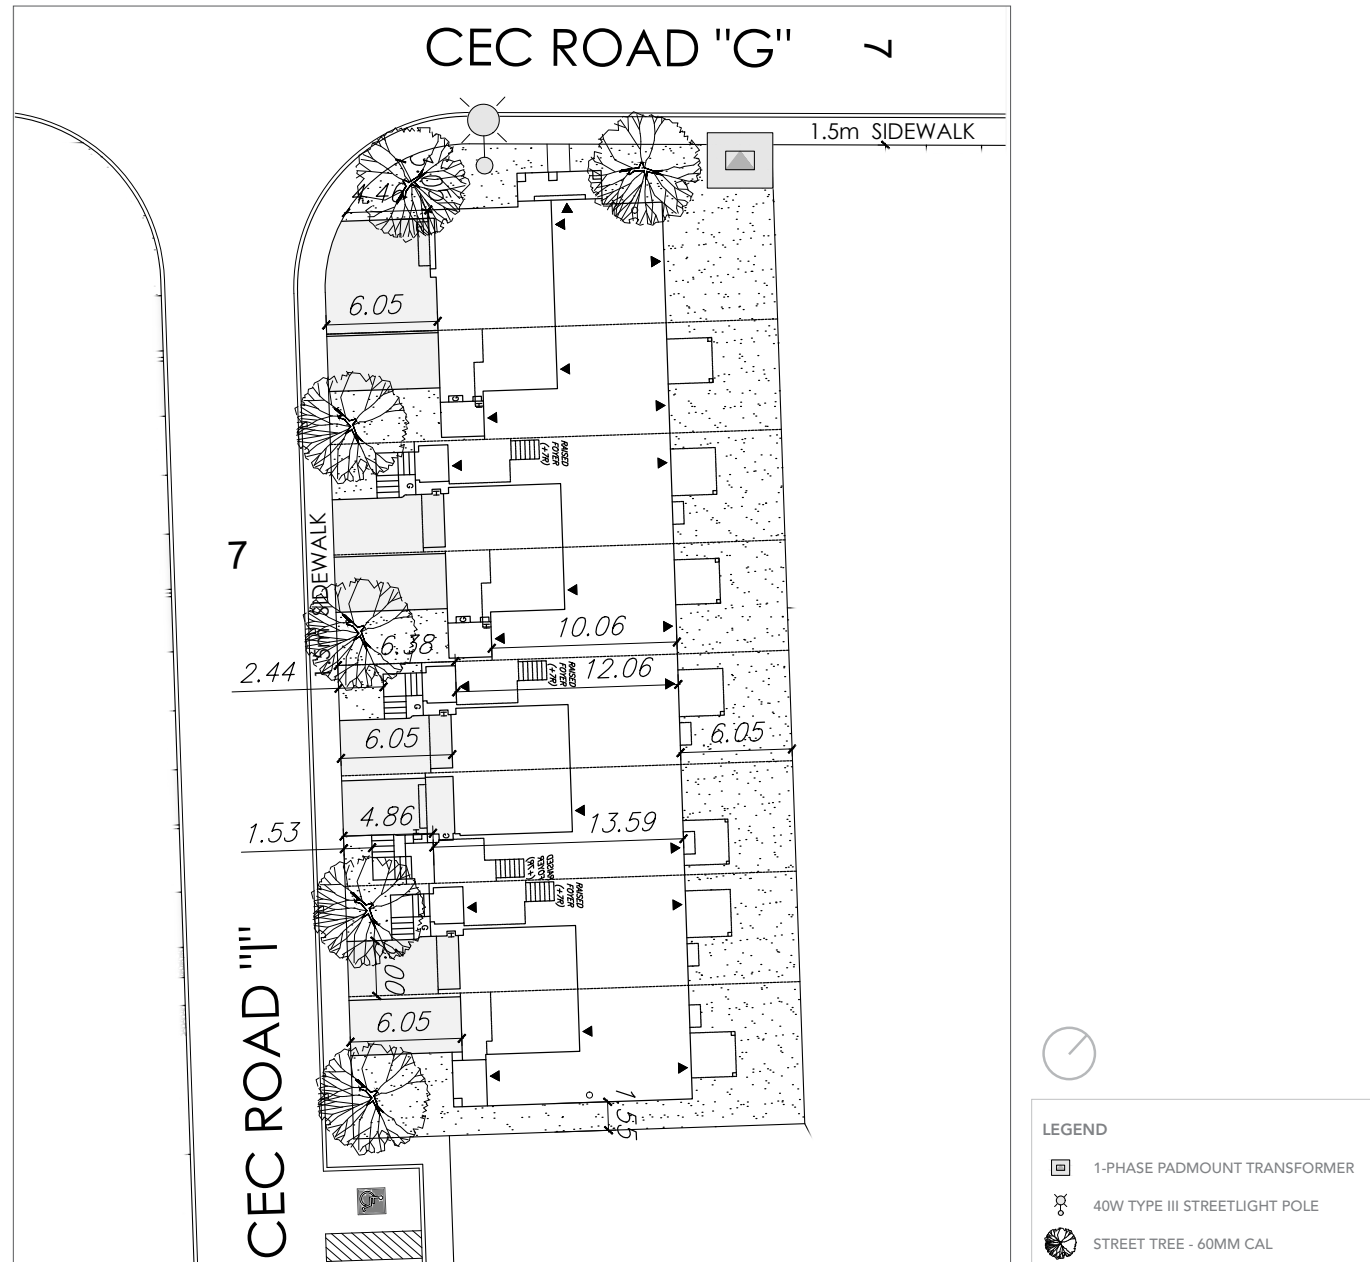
Conceptual Plan of Block 9 showing the proposed front-loaded townhouses, street trees, and light standards along Road "I" and Road "G"
